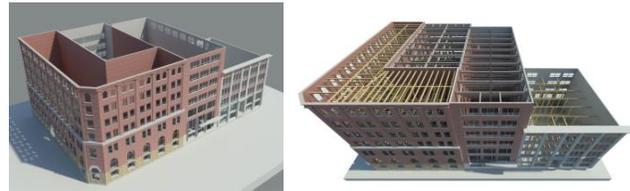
(left) Completed envelopes and (right) structural framing of the four buildings.
